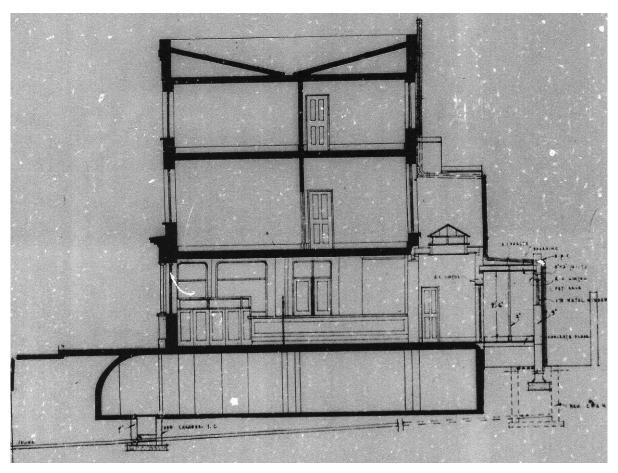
A section through the building in 1936 from a drainage application (Camden Archives, ref. 578/1080/2)
